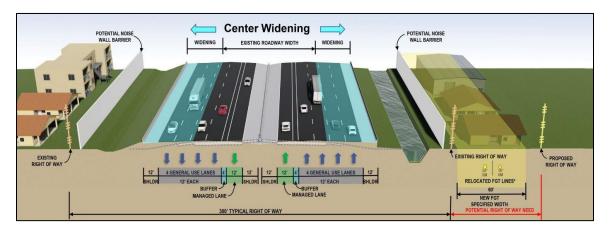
Segment 1 Preferred Alternative Typical Section
